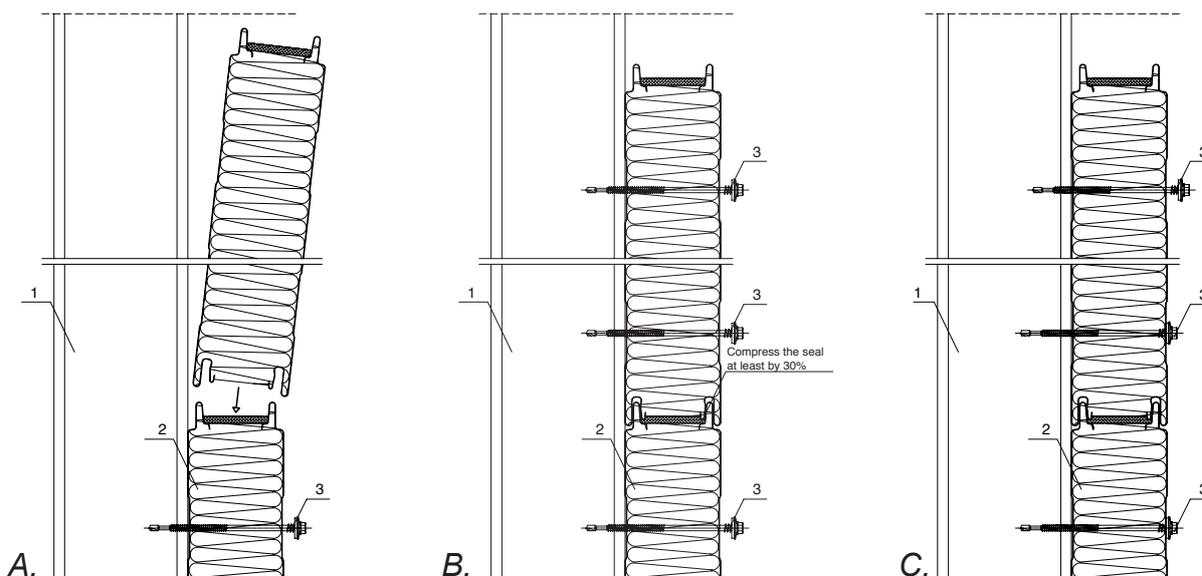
Sample assembly of sandwich panels in horizontal arrangement, where:
